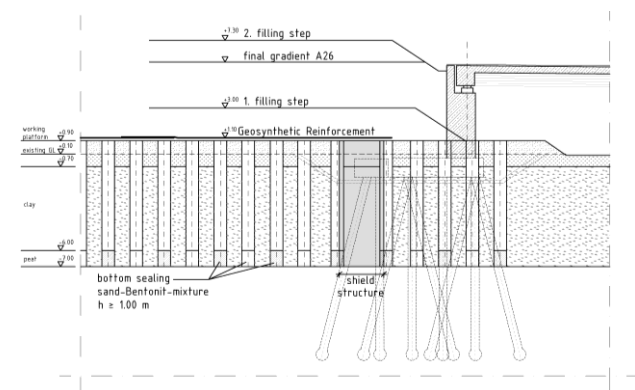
Typical longitudinal section of a piled bridge abutment with CFP, Bridge BW 8091-West, modified from Ed. Züblin AG
